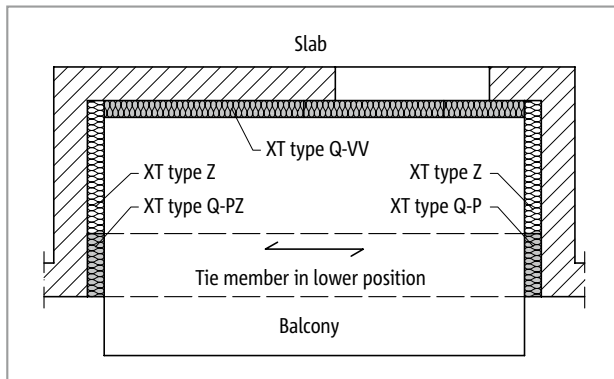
Schöck Isokorb® XT type Q-VV, Q-P, Q-PZ: Recessed balcony, supported on three sides with tie member
